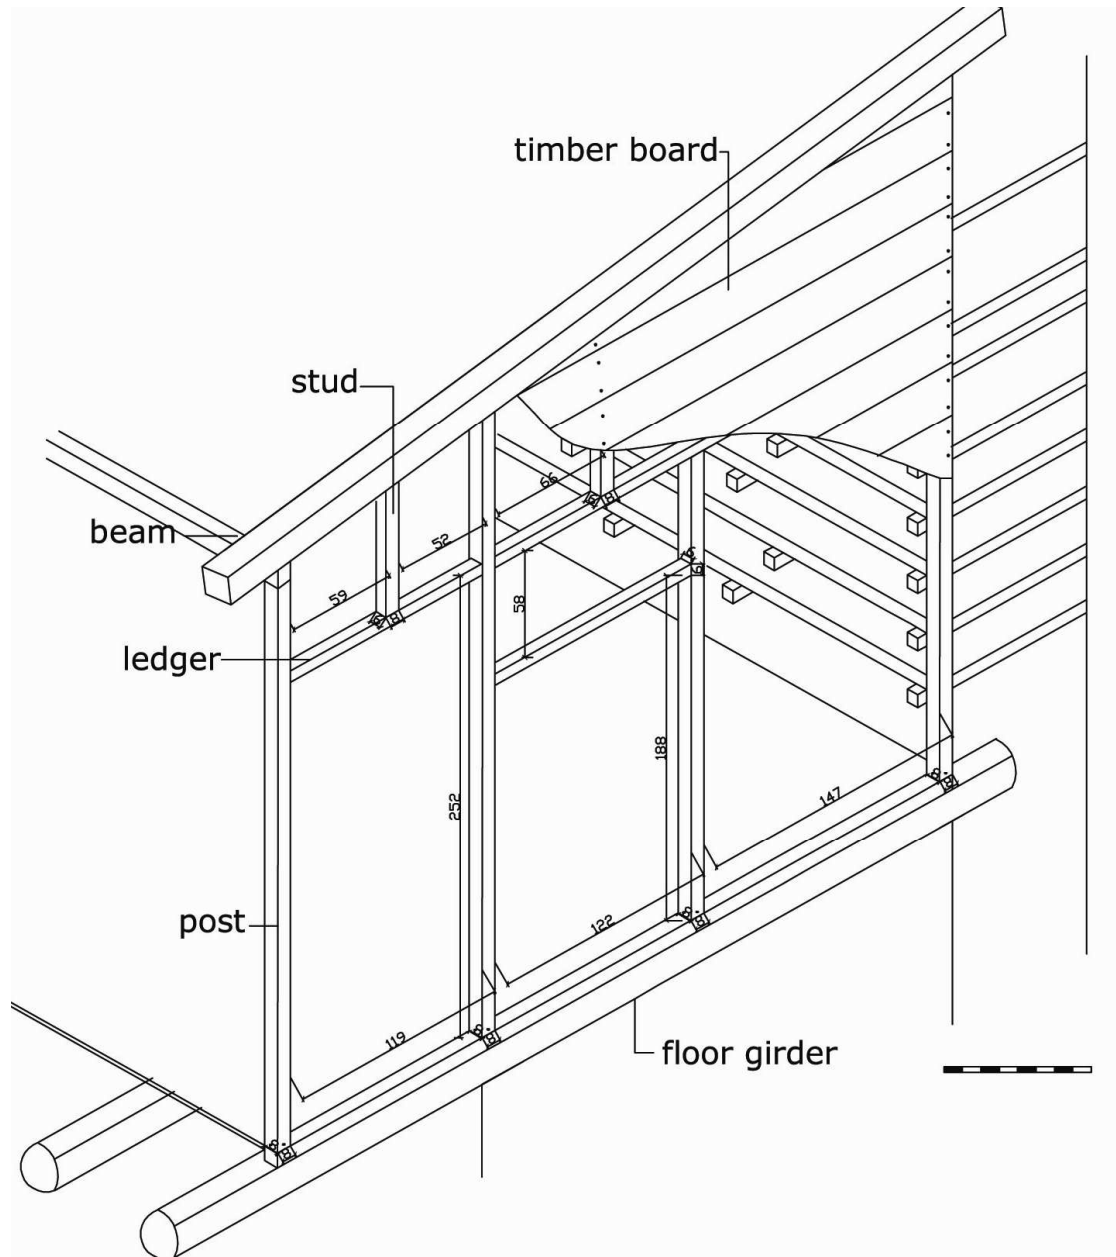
20Drawing of the timber wall type 3. Çelik 2008.
